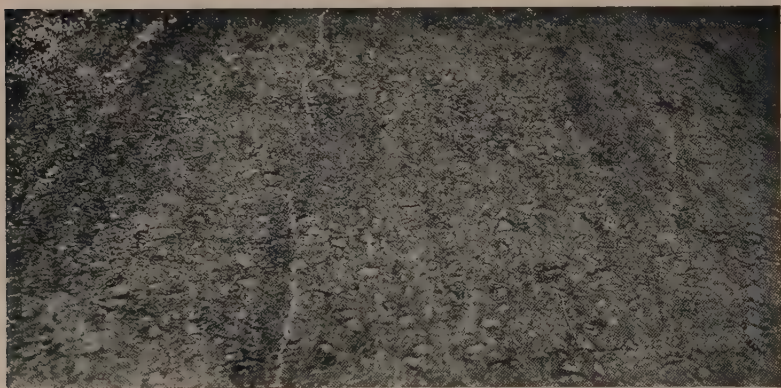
Surface of Macadam Road Showing Large Broken Stone.
